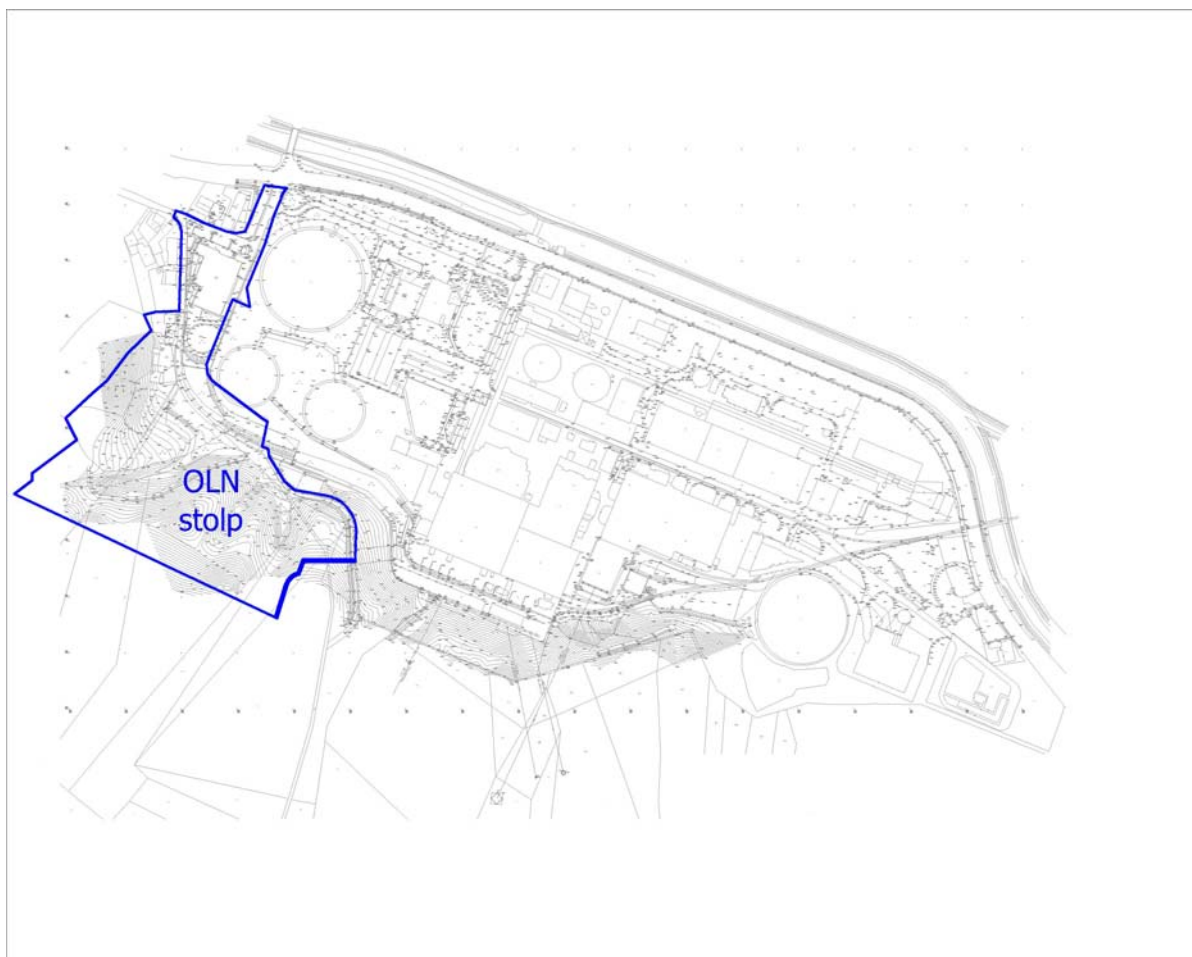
Area of the planned Local detailed plan Tower and Chimney Stack 6 TEŠ. (Source: ZUM Maribor)
